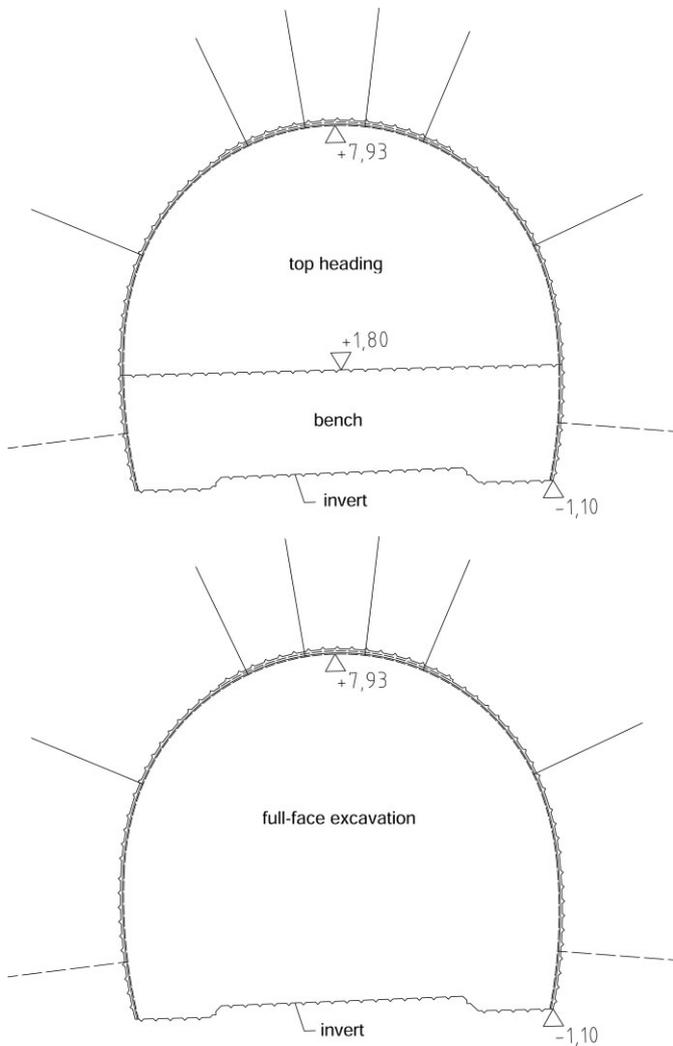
Double-track road tunnel with staged top heading/bench excavation and full-face excavation
